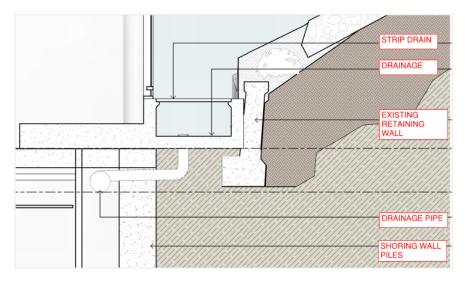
Sketch of section through proposed strip drain from Architectural Plans
